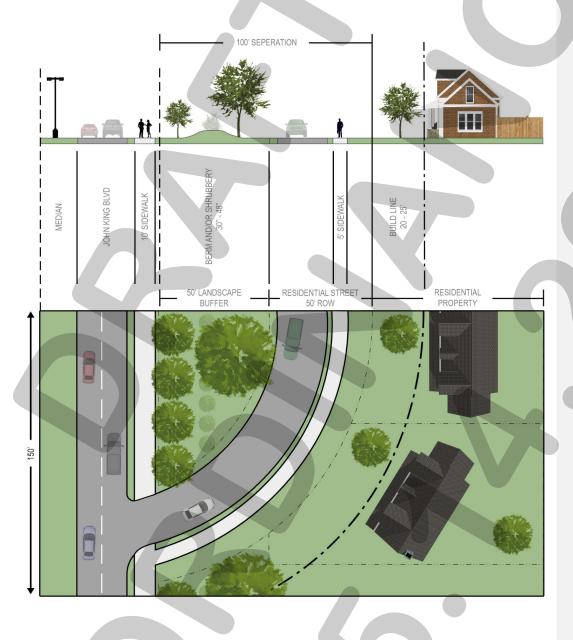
DESIGN ALTERNATIVE #4; SLIP STREET
